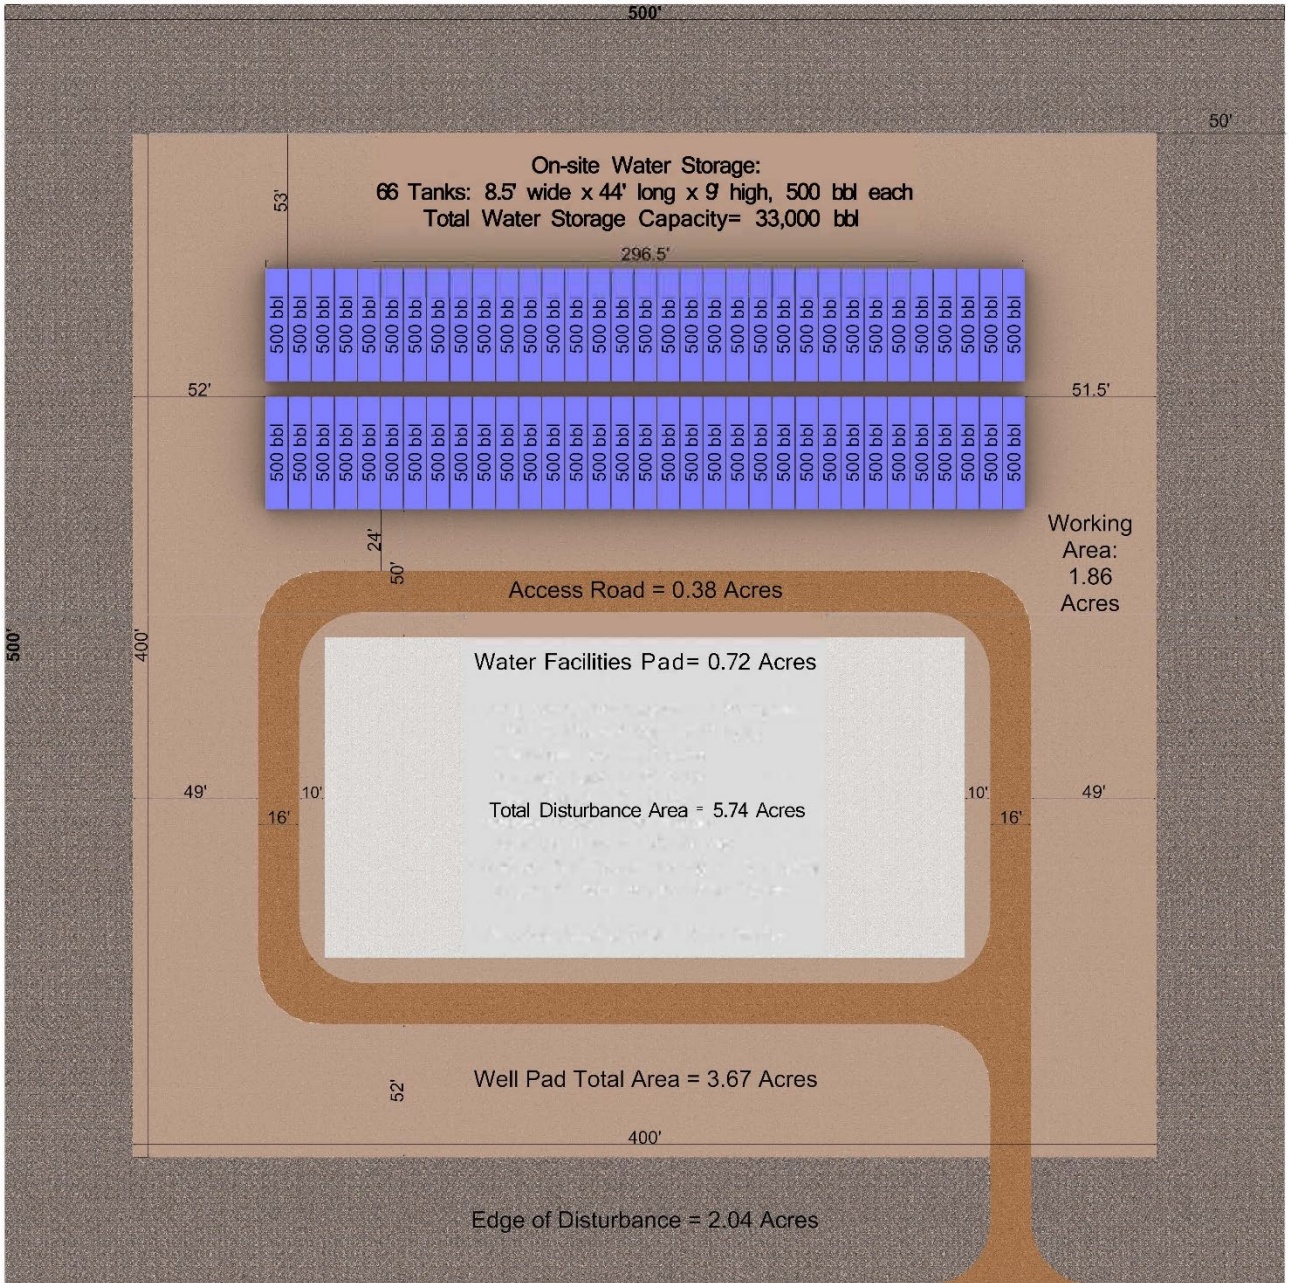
Typical LOGOS Water Containment Layout with Horizontal Tanks
